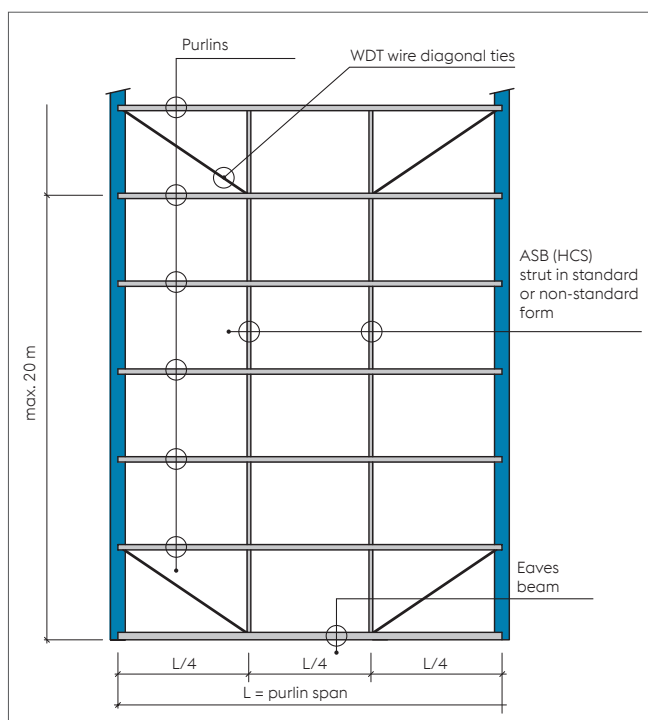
Bracing of purlins in duo-pitch or mono-pitch roofs featuring two rows of struts
